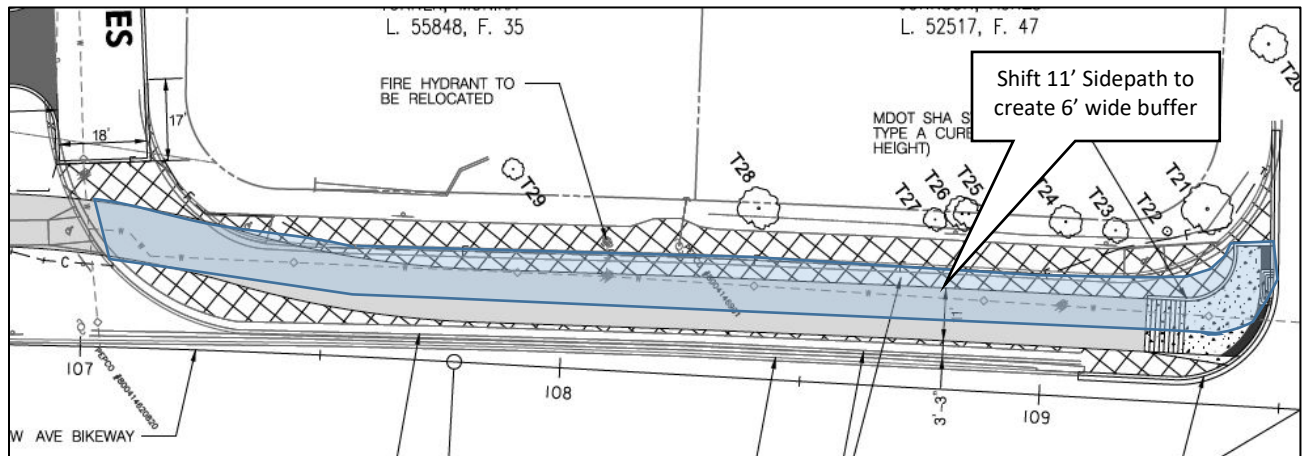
New Ave Bikeway at Prince George's Avenue to Belford Place – Proposed Modifications
